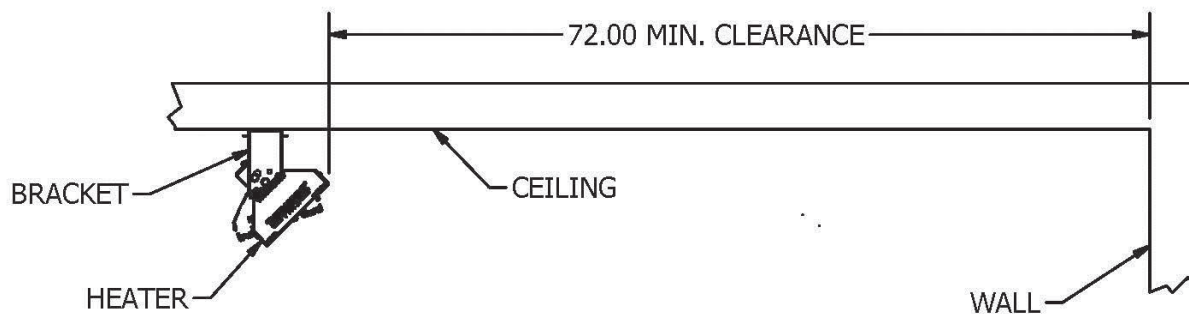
CEILING MOUNTING ANGLED TOWARDS VERTICAL SURFACE
